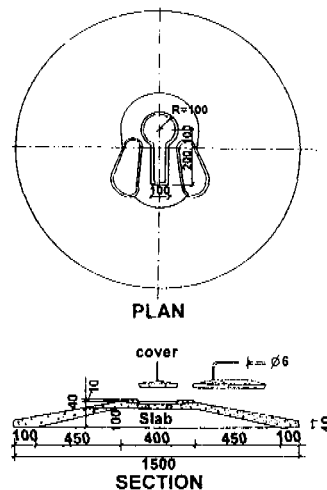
Round, conical, unreinforced concrete squatting slab of a simple pit latrine
